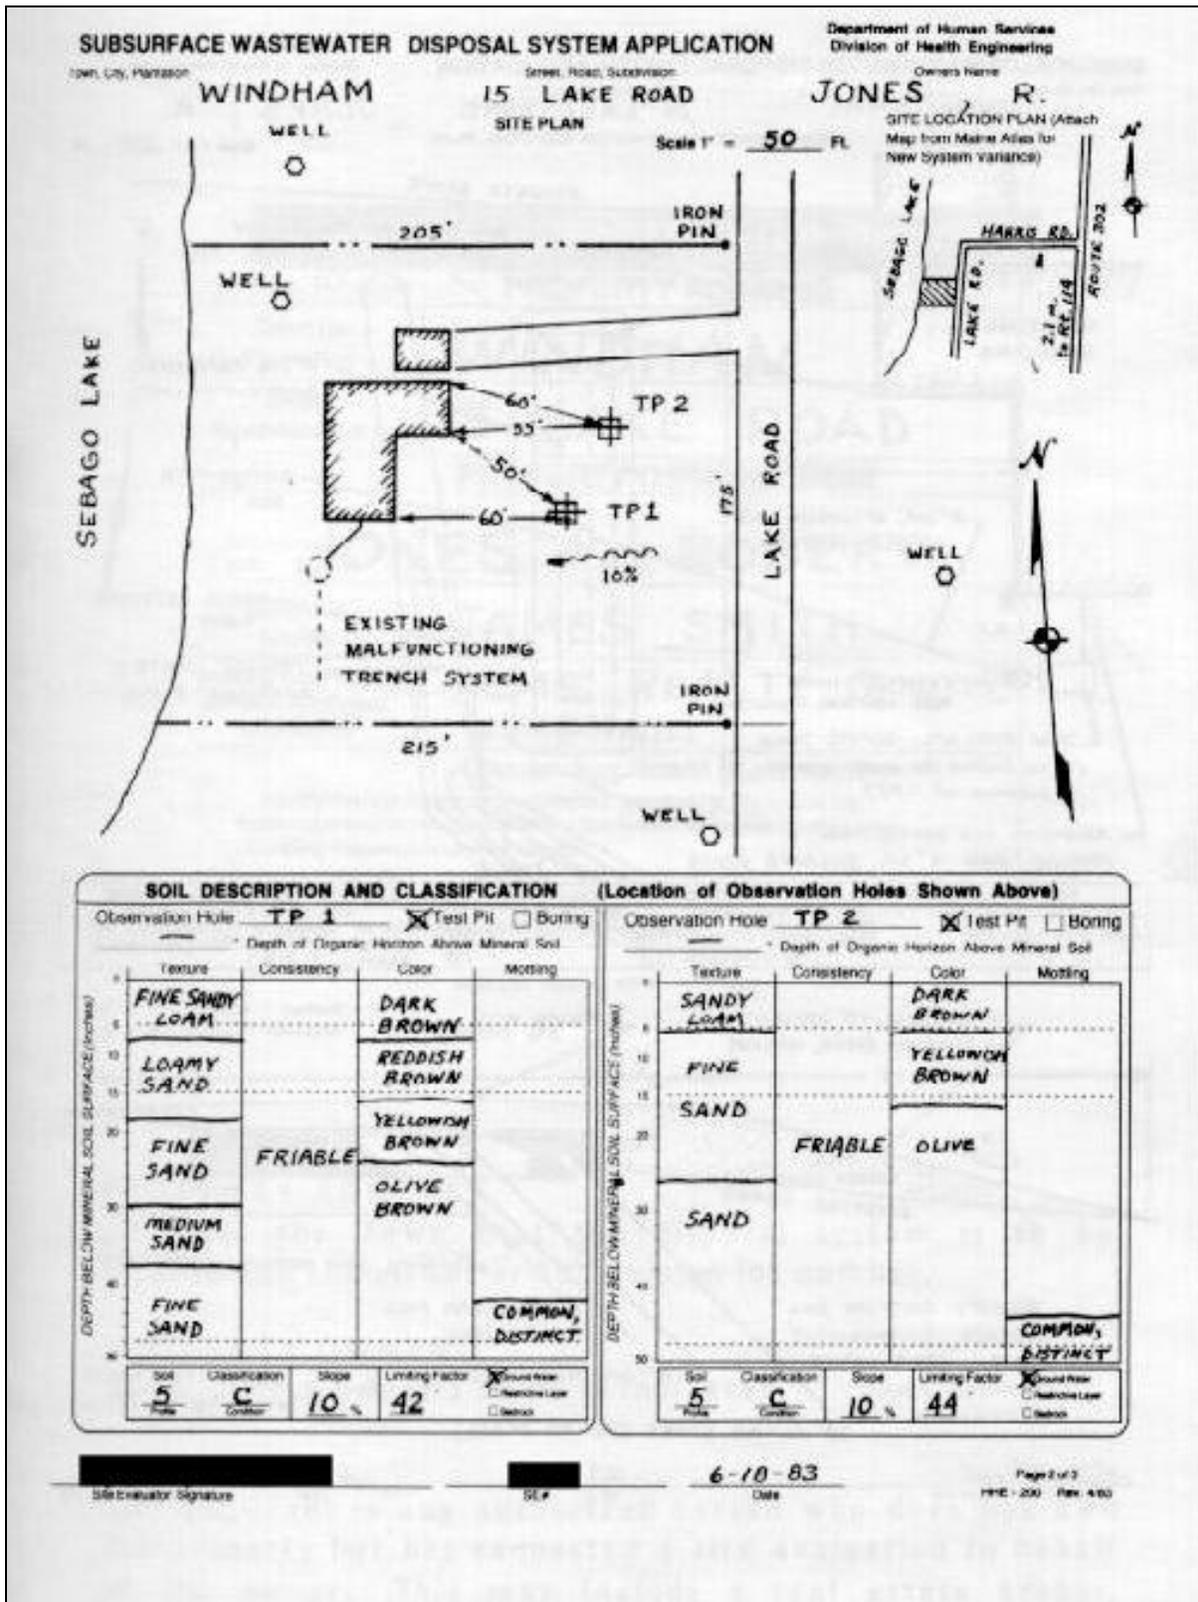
APPLICATION FOR ON-SITE WASTEWATER DISPOSAL SYSTEM (PAGE 2)
